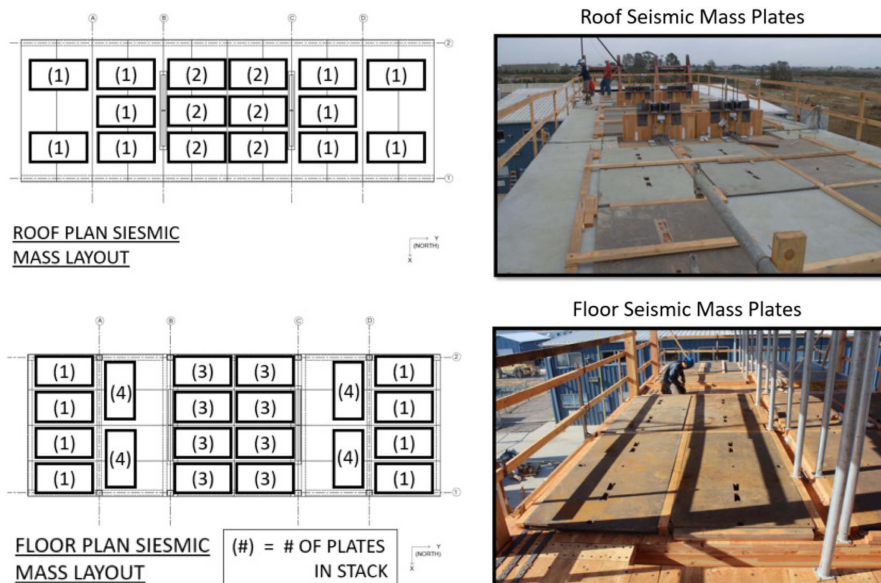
Arrangement of the additional seismic mass on the roof and floor.
